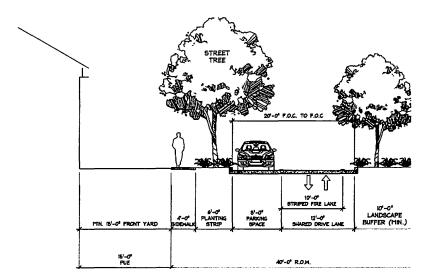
EXHIBIT F - PD STREET STANDARDS - REFERENCE PLAN Planned Development District No.5 Heritage Subdivision Planned Develop
